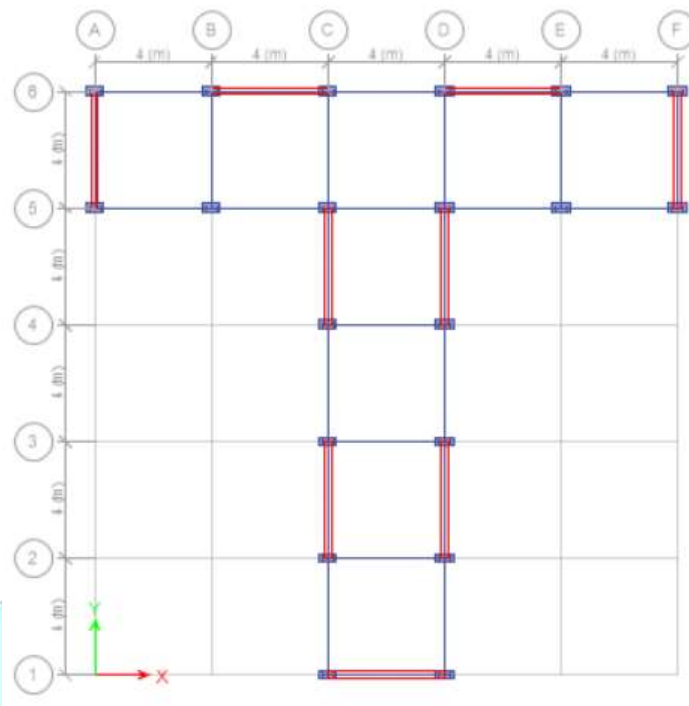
IRREGULAR PLAN WITH COMPOSITE COLUMN
